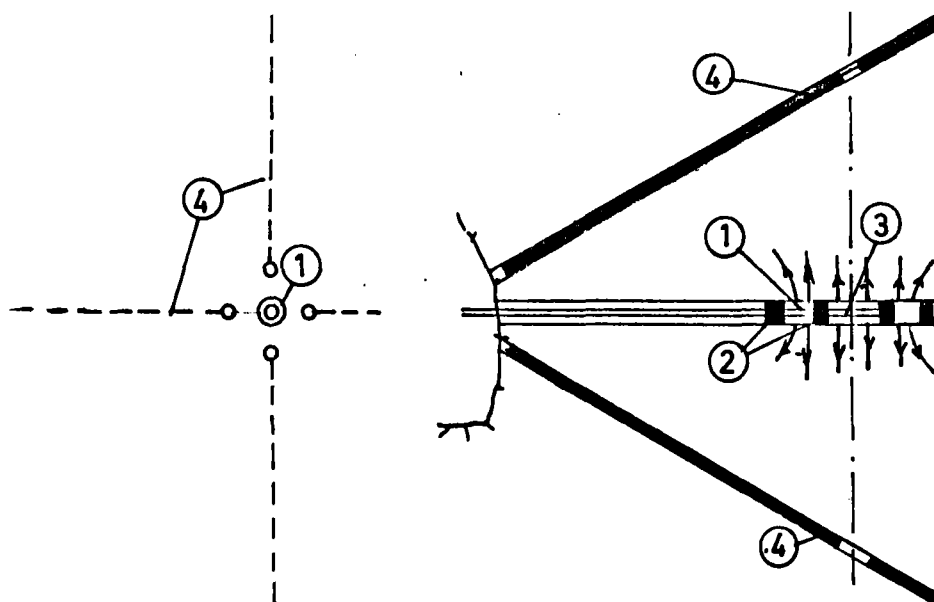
Hydraulic test carried out at Grand Maison dam-site (see fig. 10b)
